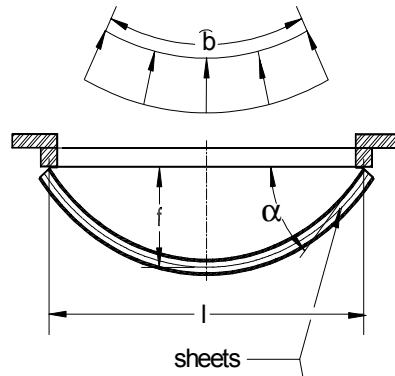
Test set-up (schematic), gravity load and uplift load for flat roof kits with additional bearing profiles parallel to the span
